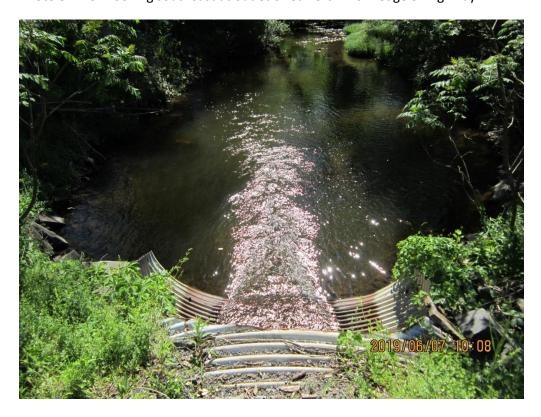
View looking east at outlet of Culvert and downstream – from edge of highway.
